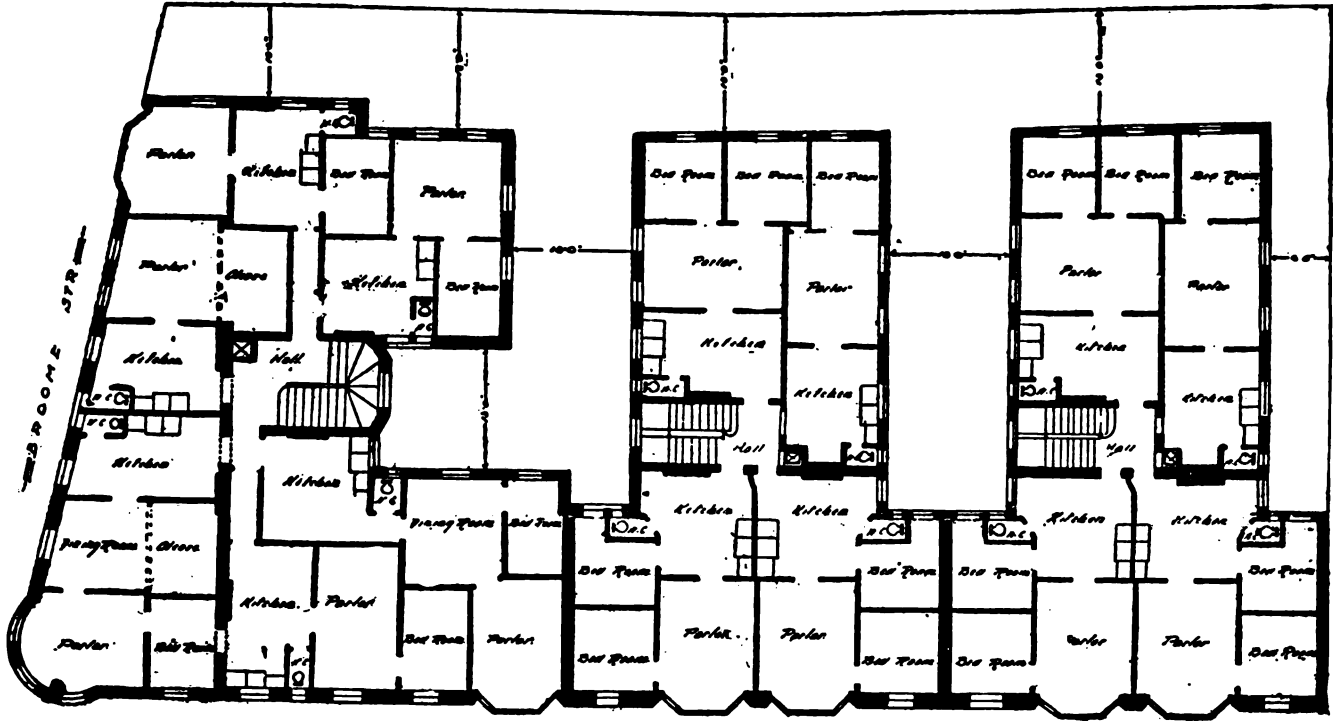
PLAN OF TENEMENTS ON BROOME STREET, NEW YORK. MESSRS. SASS & SMALLHEISER, ARCHITECTS.
